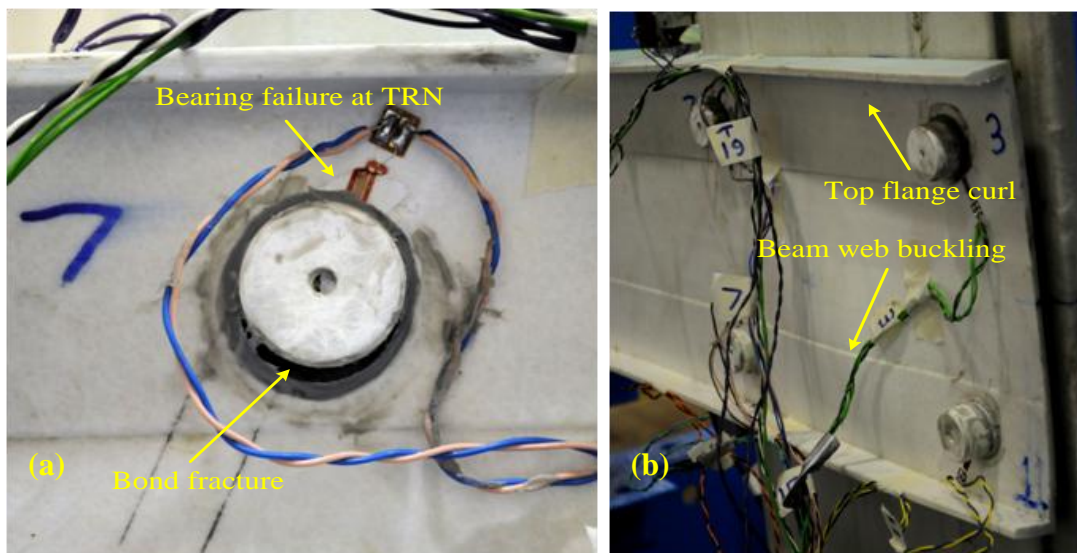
SAJ-4 failure mode: (a) bearing failure; (b) beam web local buckling.
